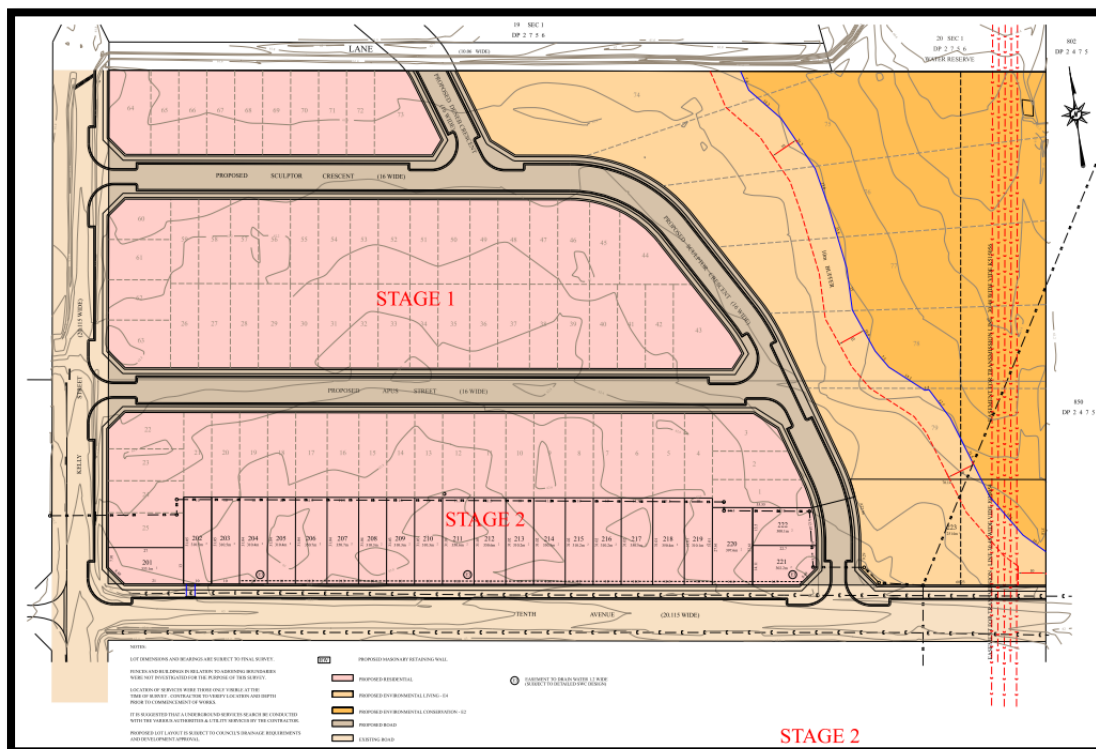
Stage 2 Subdivision Plan (Source: R. S. Canceri)
